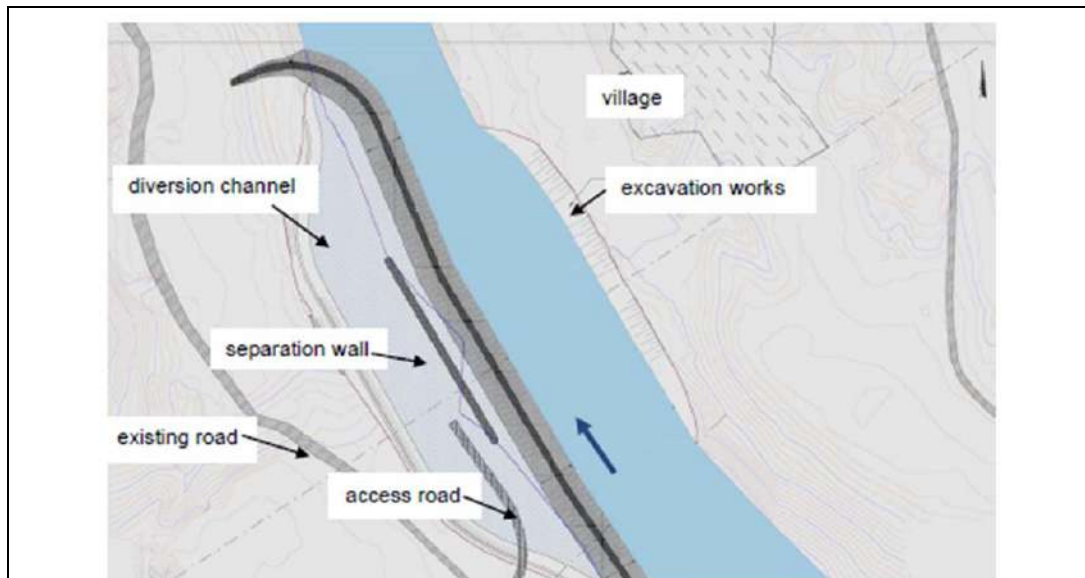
Construction Phase 1 - Excavation of Diversion Channel
